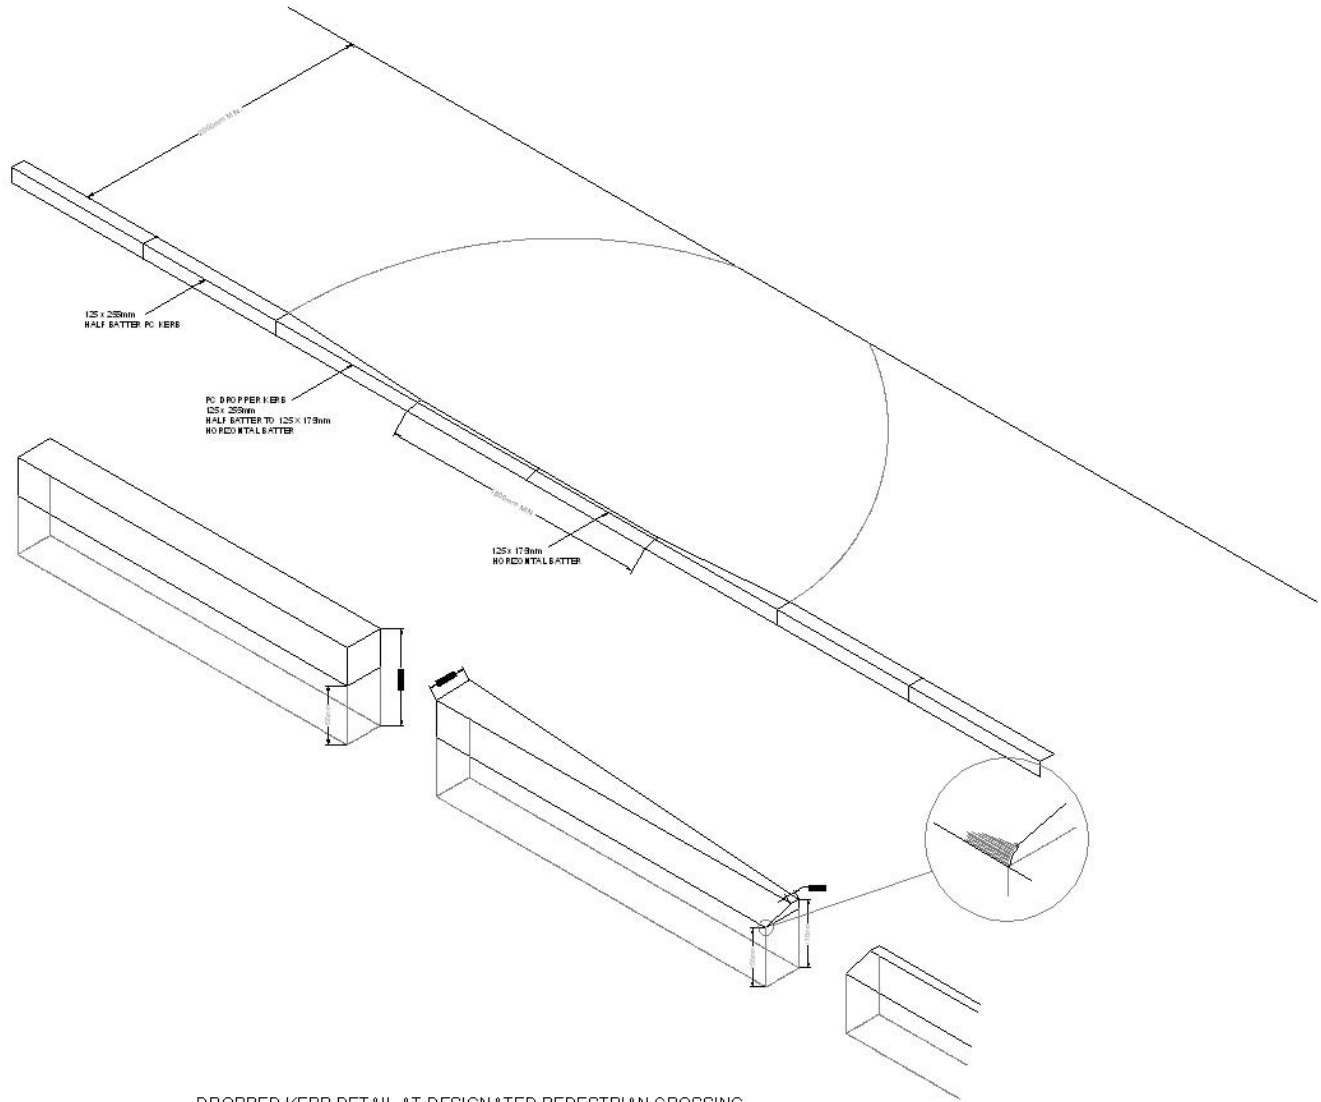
Dropped kerb detail at designated pedestrian crossing
